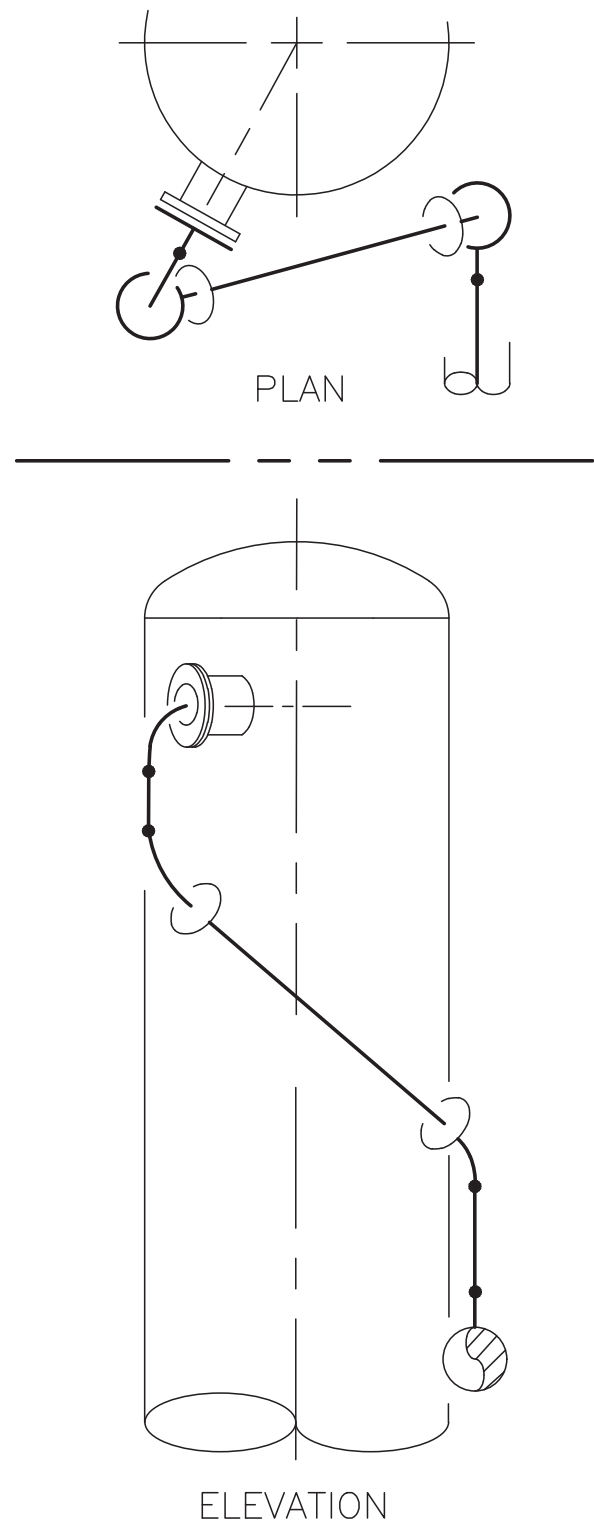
Plan and Elevation views of a rolling offset.
